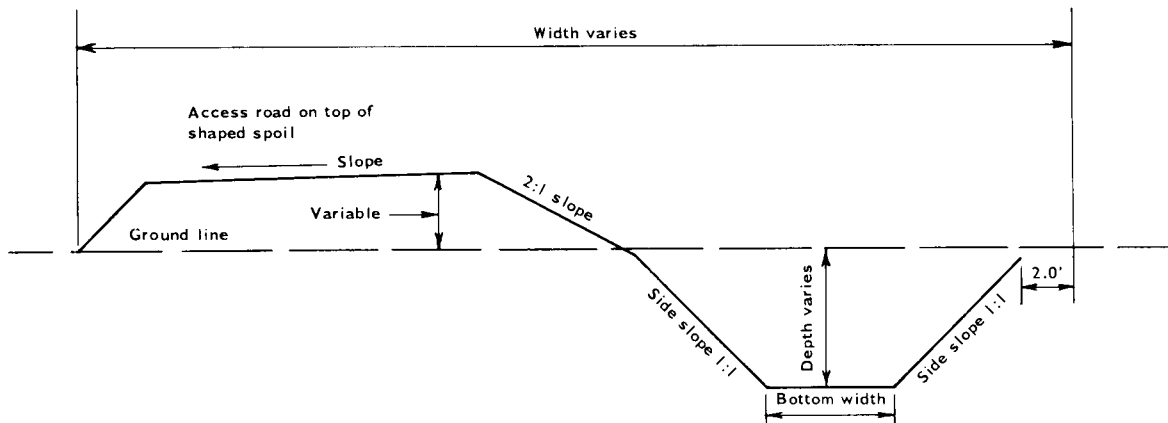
Typical Main Ditch Cross-Section Showing Basis For Determining Right-Of-Way Width
